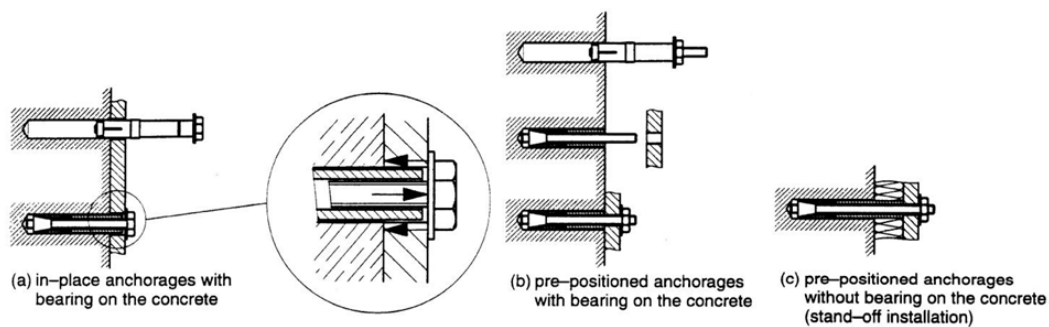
Installation configurations (adapted from EOTA (2013c))
